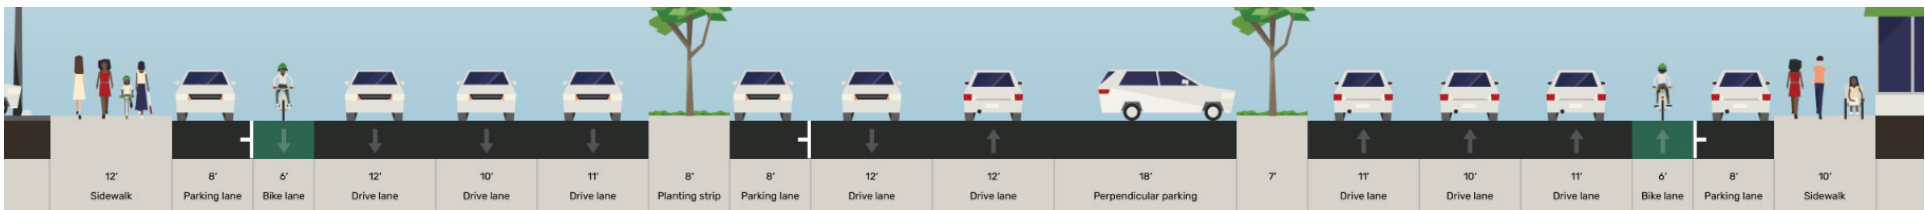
Existing cross-section: Hawthorne Blvd south of W 137th St
